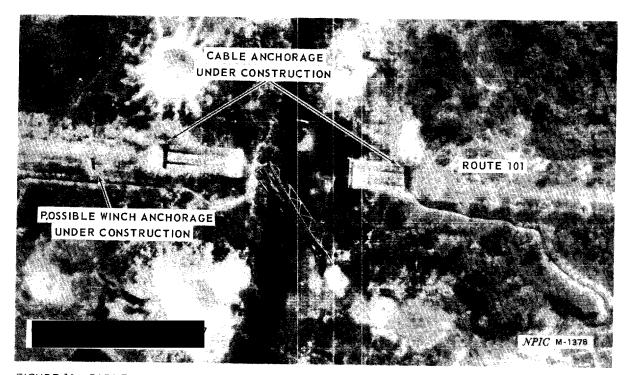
CABLE BRIDGE UNDER CONSTRUCTION OVER AN UNNAMED STREAM, TRUNG NGHIA AREA, NORTH VIETNAM
